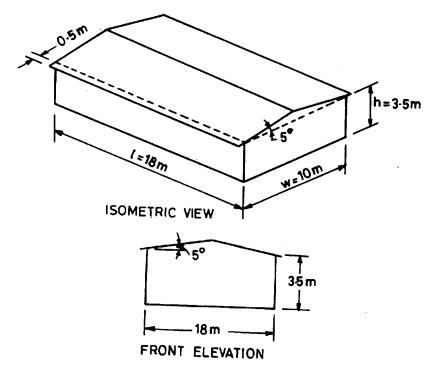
A RECTANGULAR CLAD BUILDING WITH PITCHED ROOF
